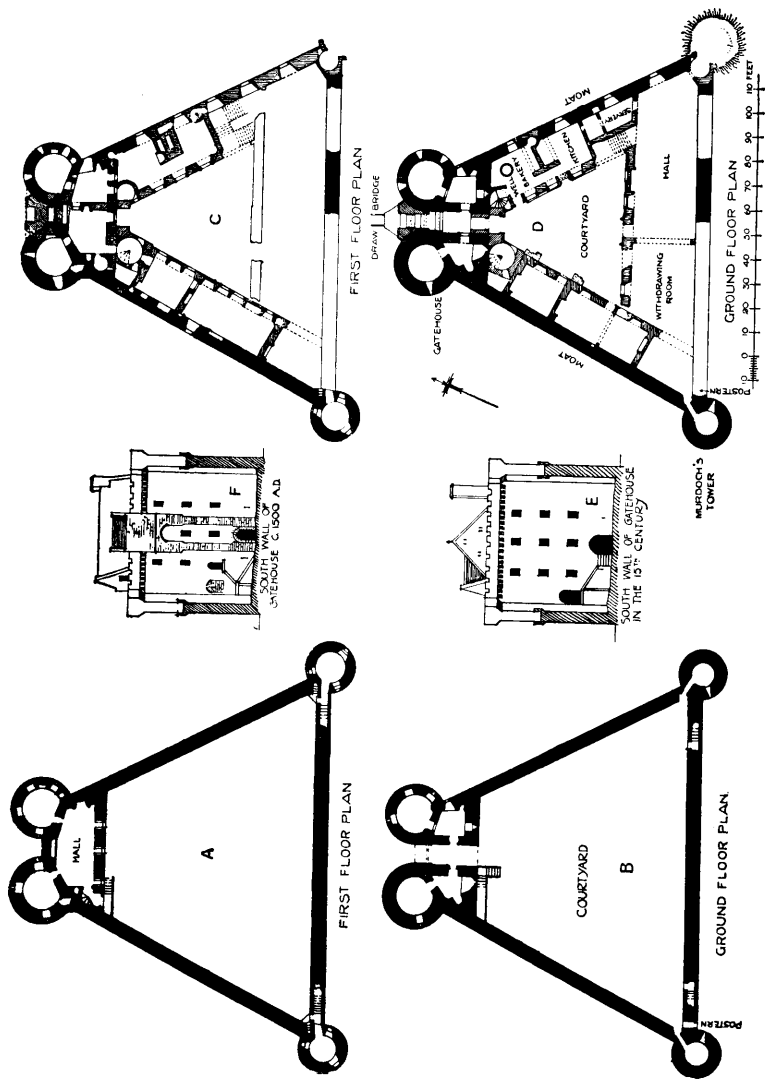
Caerlaverock Castle: A. B.—Plans of Castle as originally built; C. D.—Plans showing additions; E. F.—Elevations of South Wall of Gatehouse.
